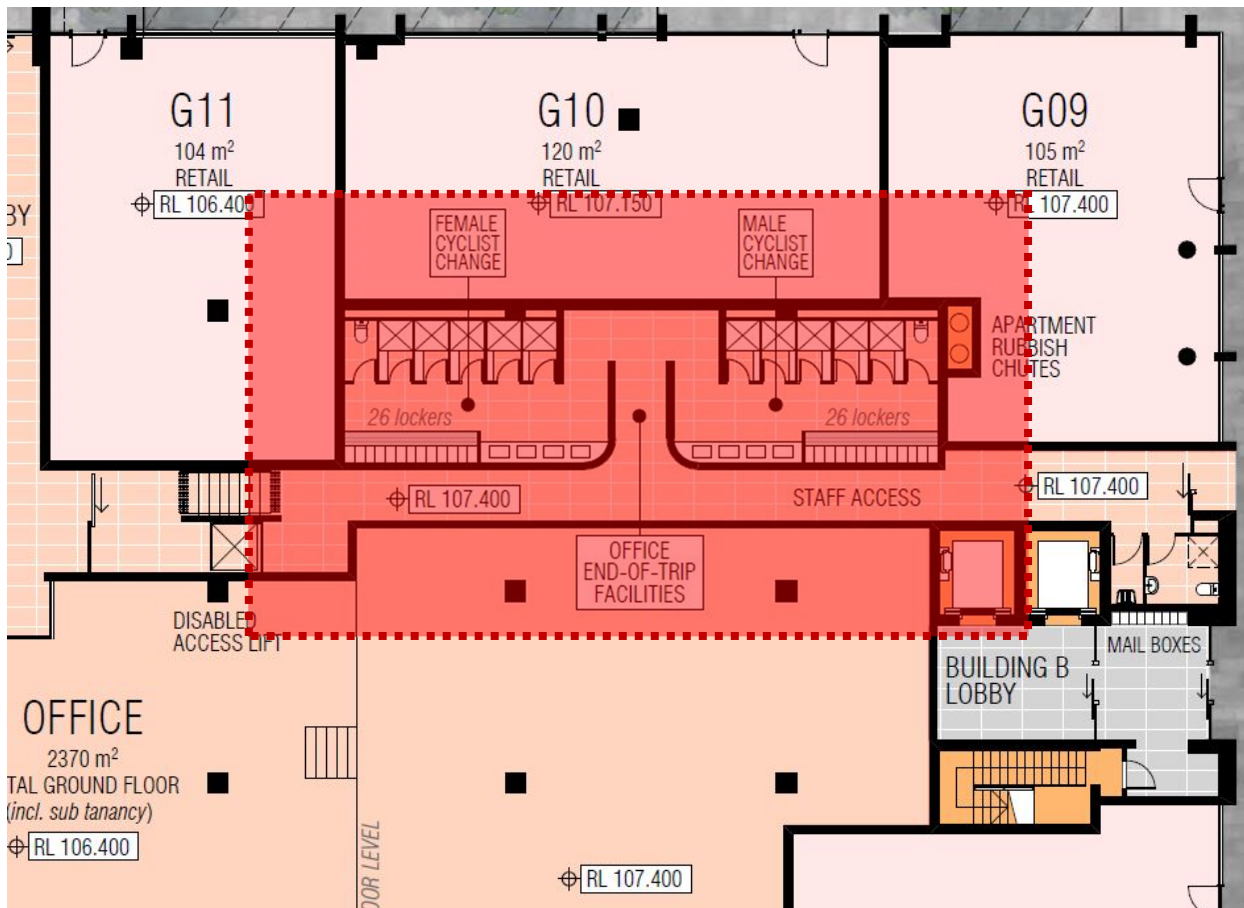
Proposed location of the end-of trip facilities (showers and lockers) on the Ground Floor Level
